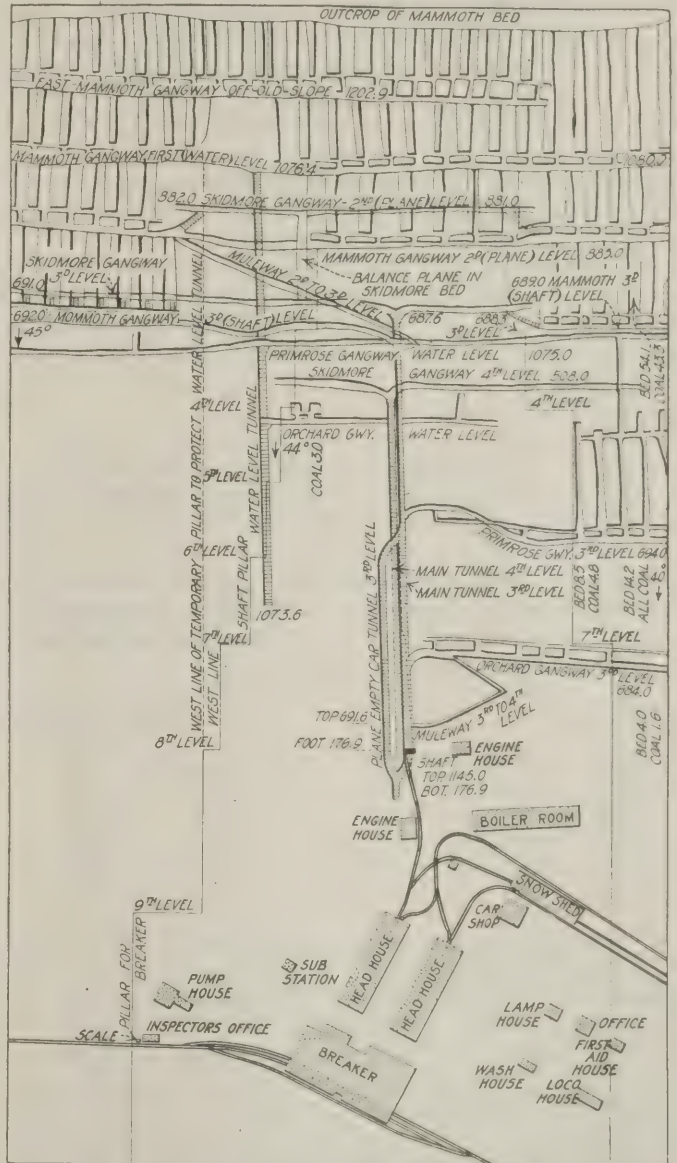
PLAN OF A SHAFT PILLAR LEFT FOR SURFACE SUPPORT
